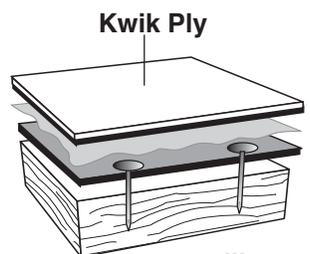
shows primer being applied over the base sheet. Illustration 5 shows the plywood deck, Kwik Base mechanically attached with large head roofing nails,
